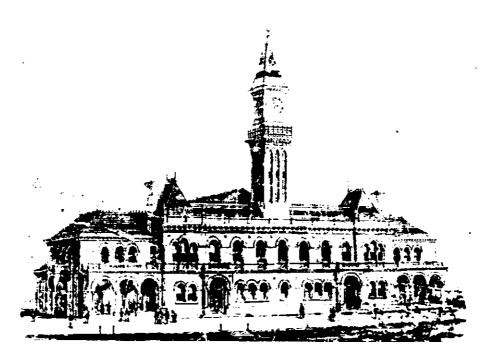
Perspective of proposed Town Hall by architect Charles Vickers, 1865.
